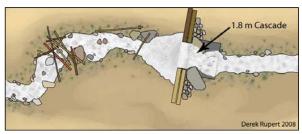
After the barrier and splash pad are completed the water barriers will be removed and the diversion trench will be backfilled. The stream will return to the original channel and flows over the fish barrier.
